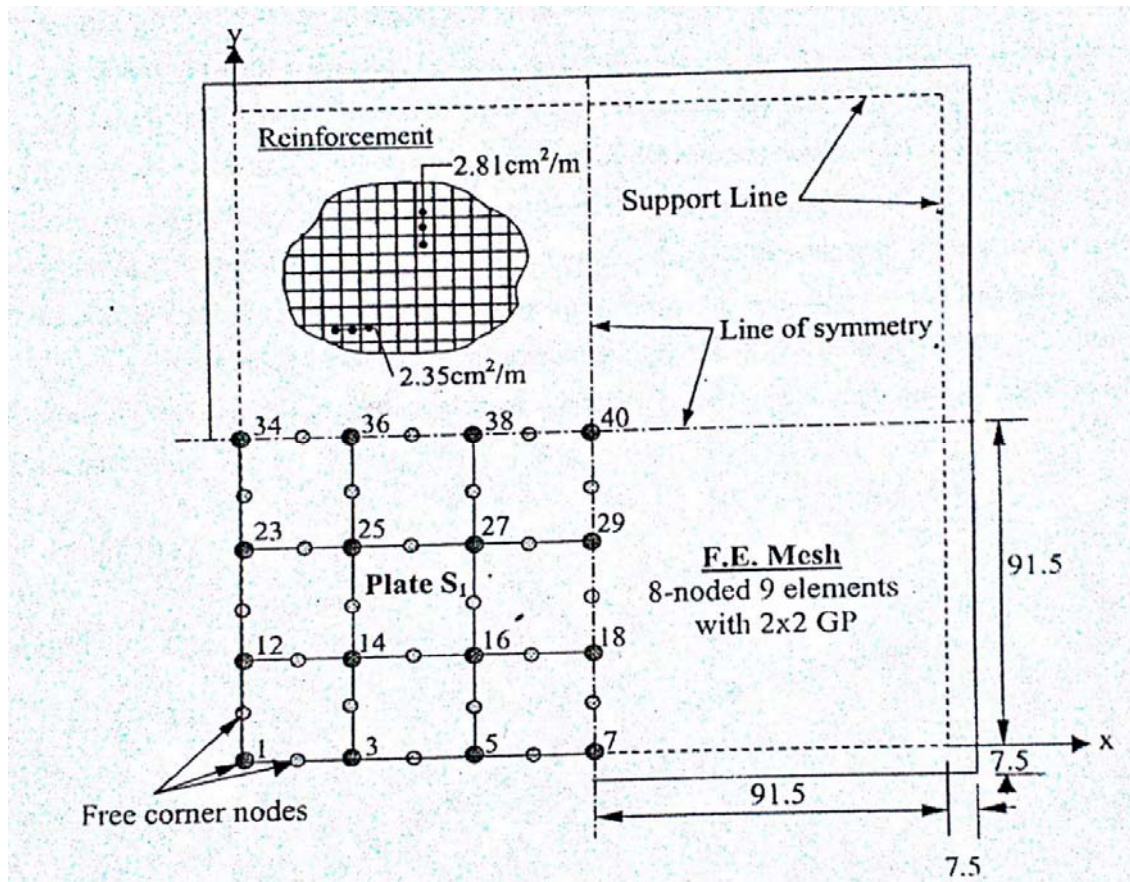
Plan and Cross section of RC slab and its FE representation [8]
